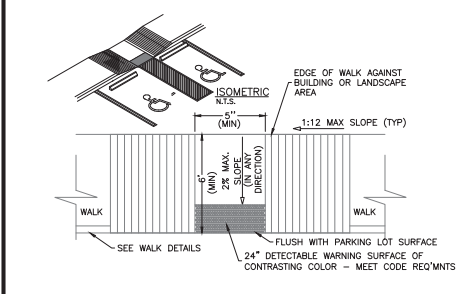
DETAIL BRUSHED CONCRETE SIDEWALK SCALE: N.T.S. ②
